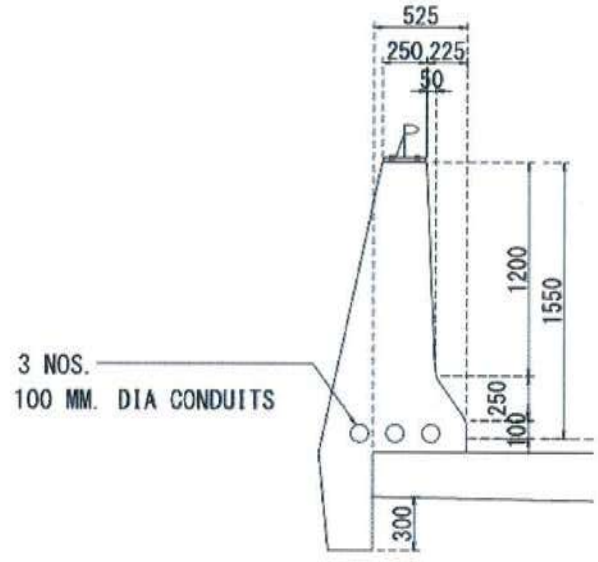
Typical dimensions of vehicle crash barrier (ref. MMRDA tender drawing B-054 rev.01).
